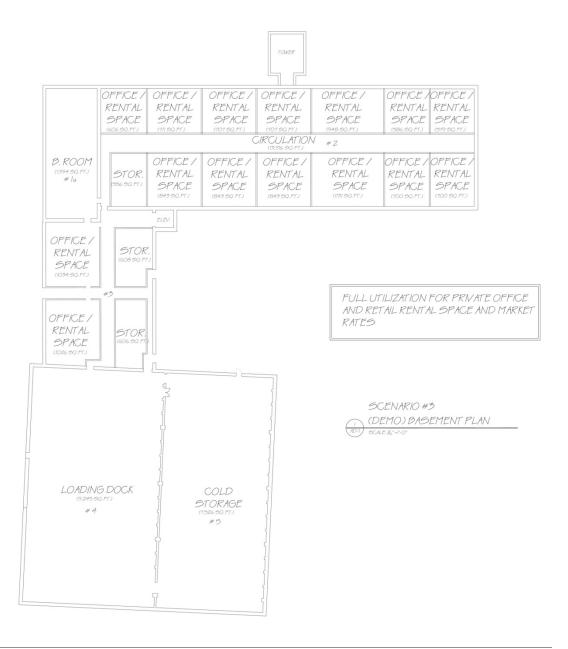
Retail and Office rental use - Option 3 Basement Plan
